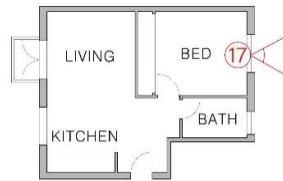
Key Plan of View 17 Locations, Not to Scale. NOTE: Floor plan indicative only.
